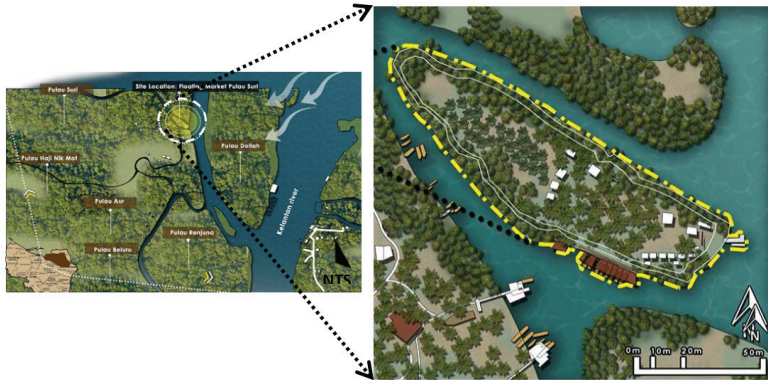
Key Plan (left) and Site Plan (right) of Pulau Suri Floating Market
